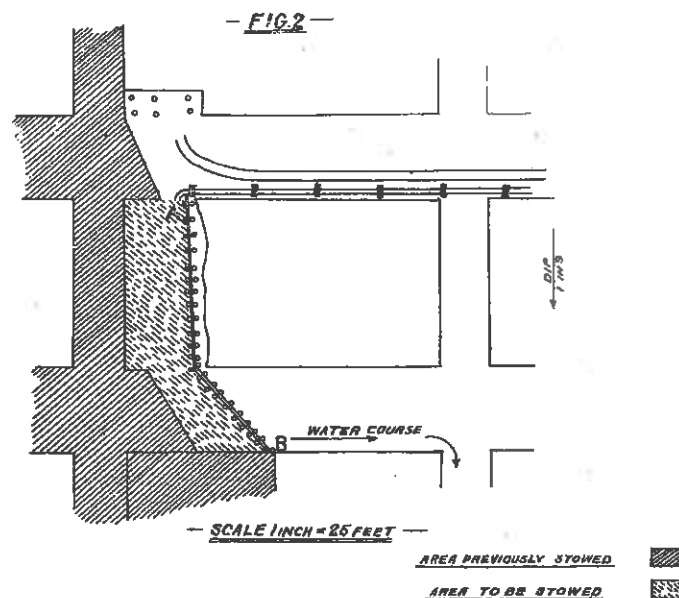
shows an enlarged view of a cut-through about to be stowed. The stowing material and water pour into the excavated area at the point 'A.' From there to the point 'B,'
